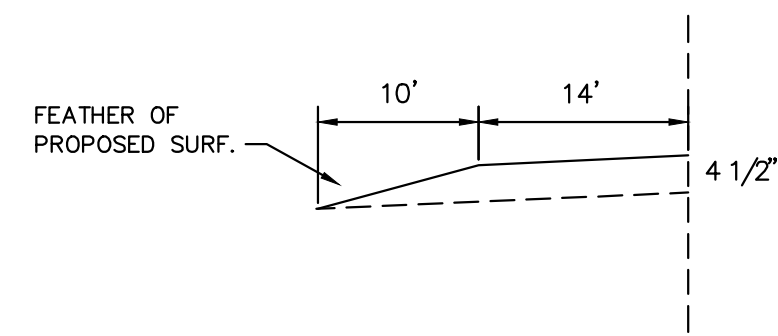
DETAILS OF SURFACING AT INTERSECTIONS AND SIDEROADS
